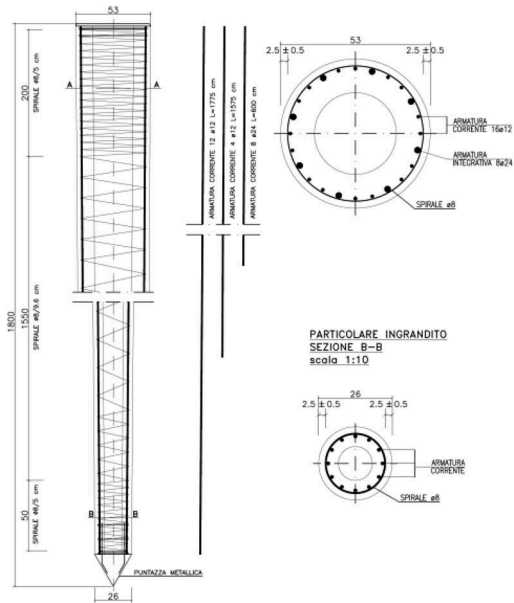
Typical tapered precast pile with length $L=18\text{m}$. Vertical sections and reinforcements.
